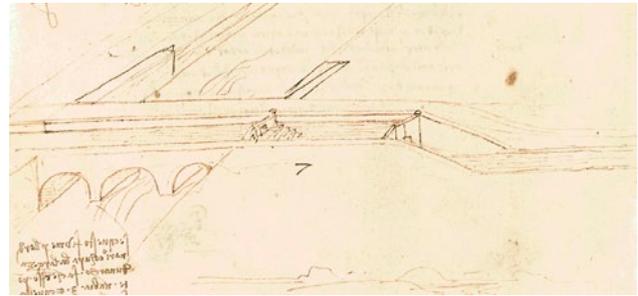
C.A., fol. 126v, detail: perspective view of the canal bridge.
